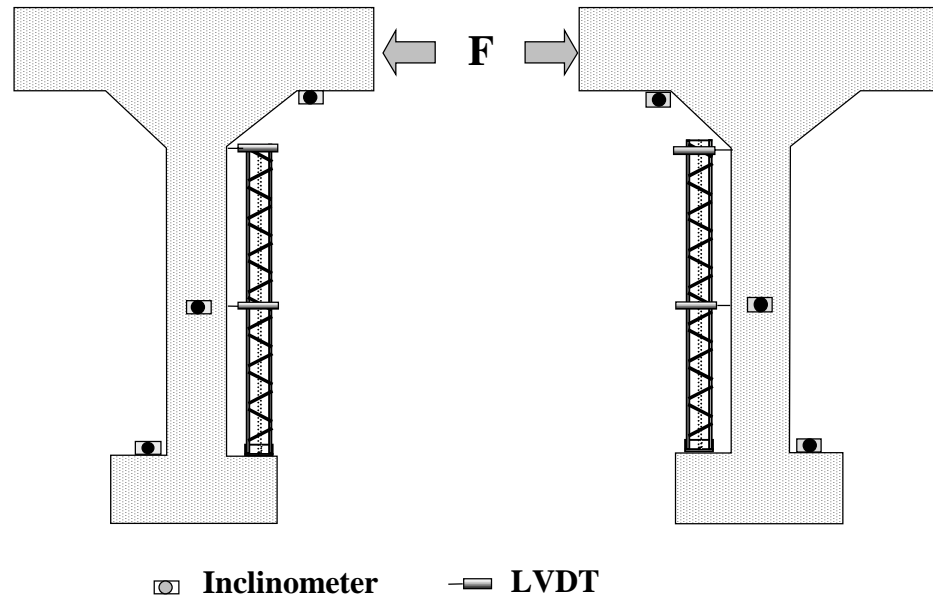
Typical locations of LVDTs and inclinometers for a bent test.
